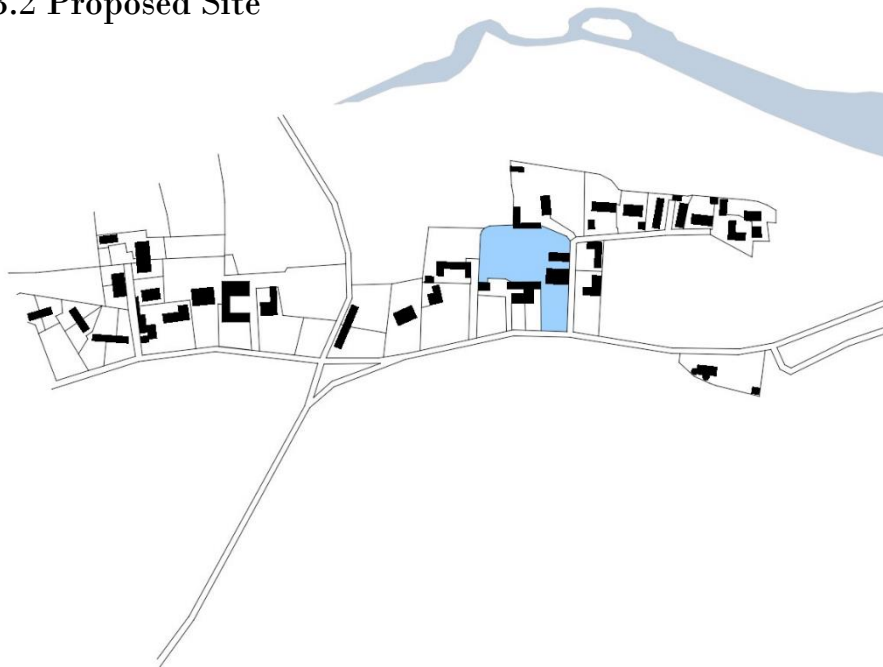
Existing Nolli Plan showing Brook House within the grain of development of the village. Plot boundaries are marked with the garden of Brook House shaded blue.
